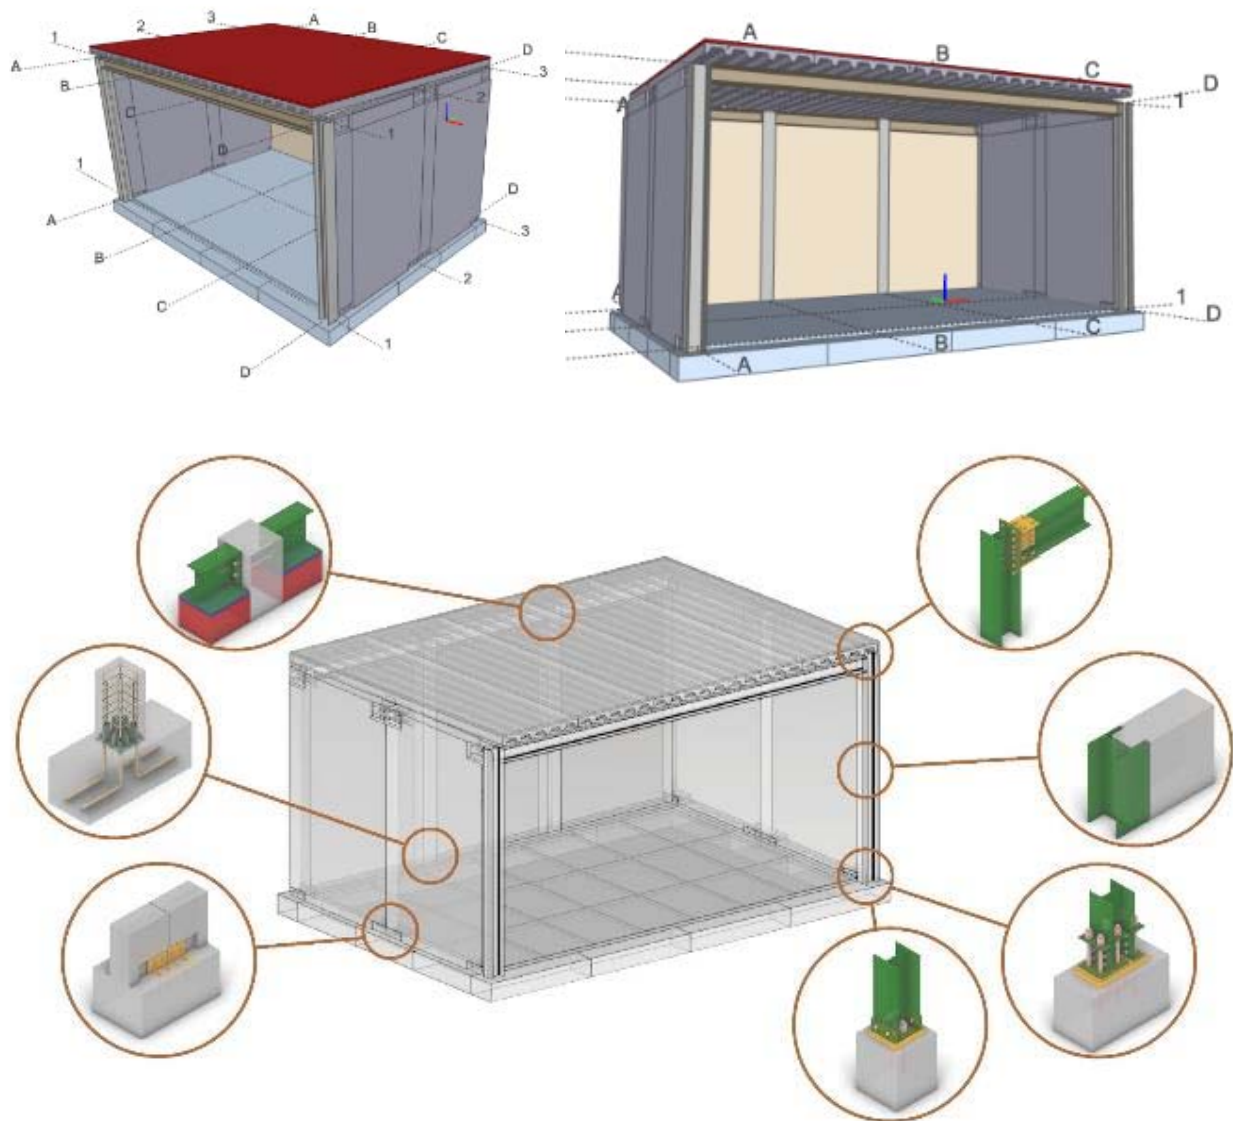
3R Pilot house with an initial concept for connections
